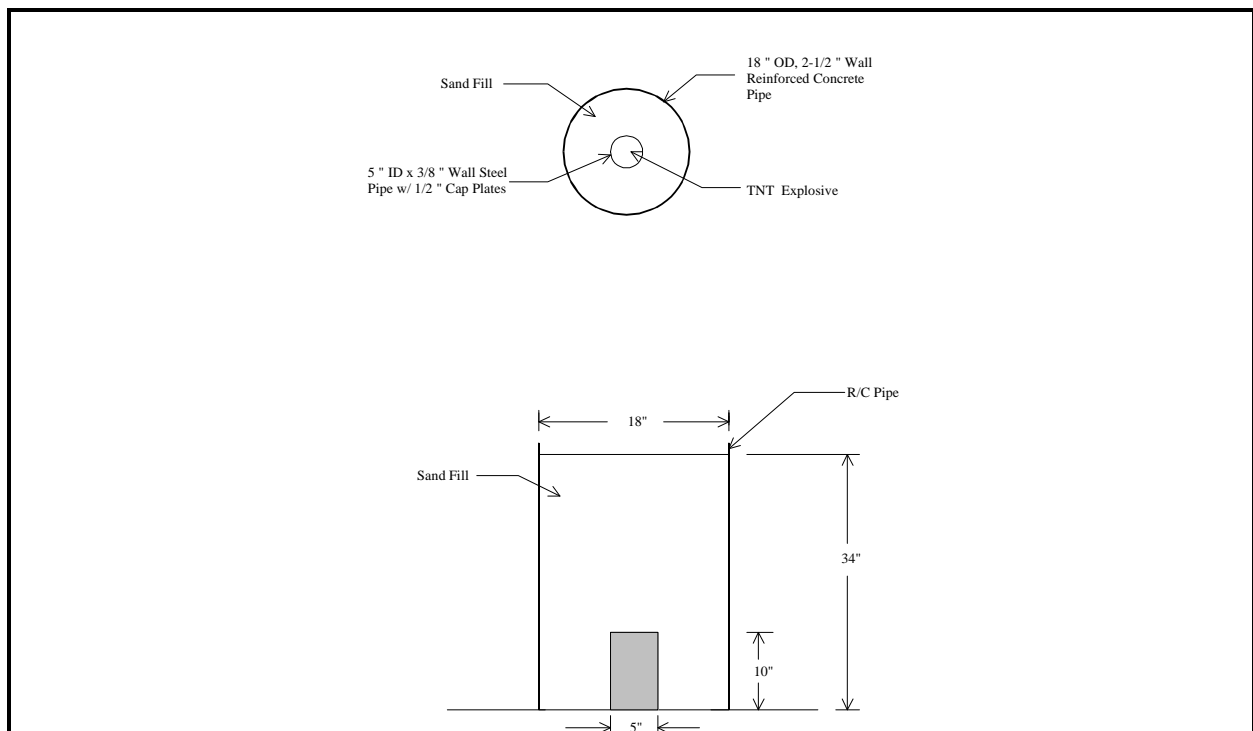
Basic Cross Section for Explosive Inside Sand-Filled Reinforced Concrete Pipe in 1:4.8 Scale Tests
